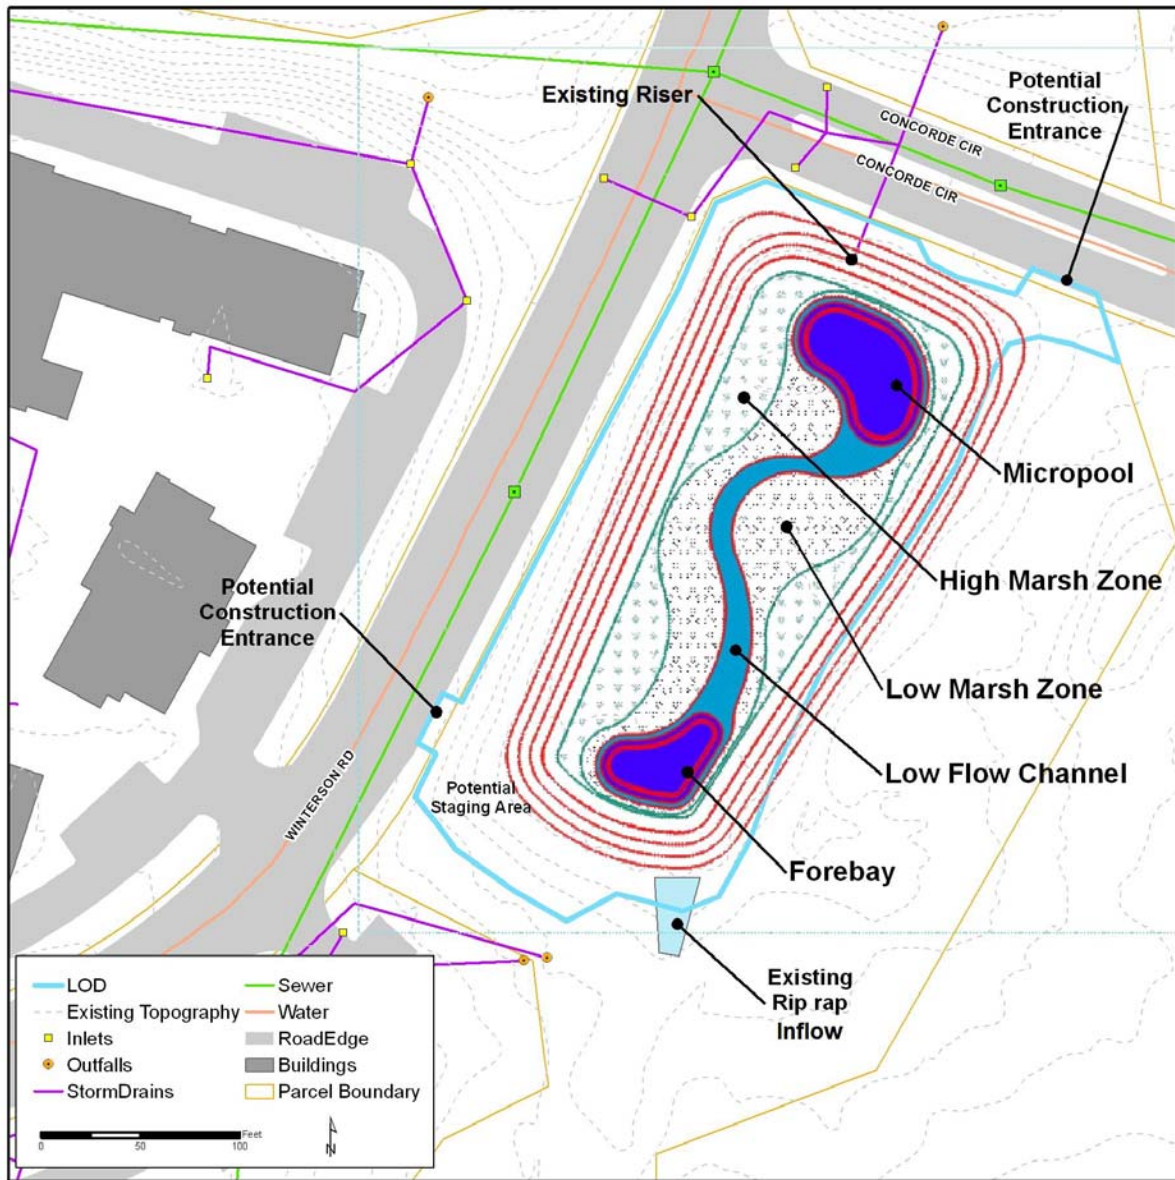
PLAN VIEW OF SHALLOW WETLAND CONCEPT
